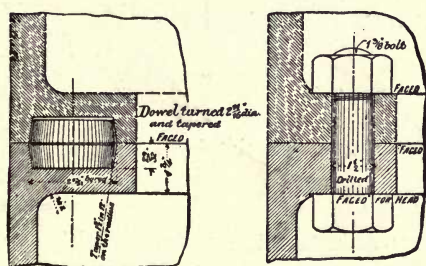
Detail of Dowel and Bolt for Screw-pile Shaft.
